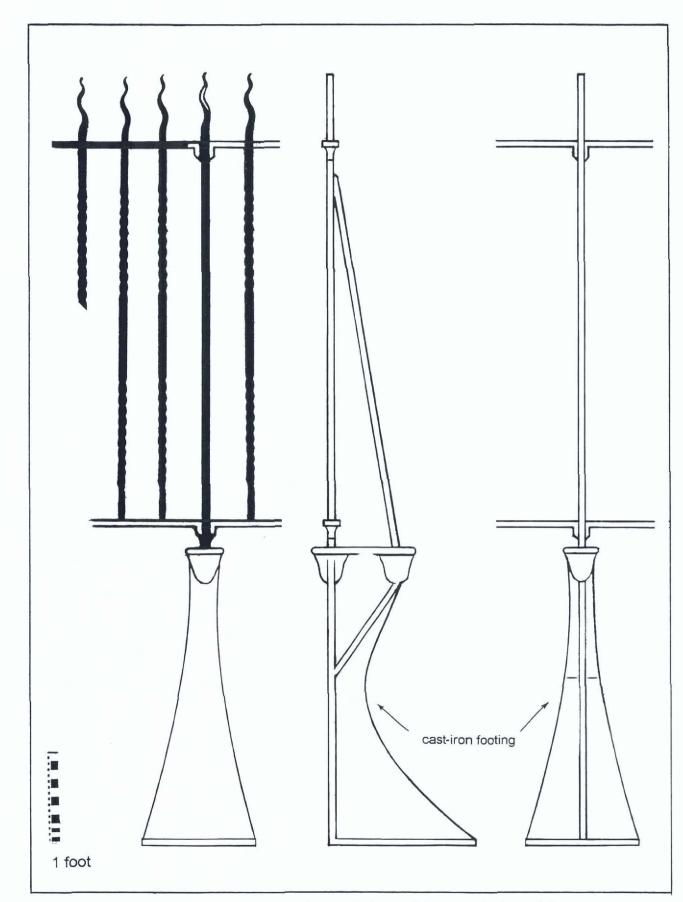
Drawing collage of several views of the wrought-iron picket fence showing the excavated brace and cast-iron footing components.
